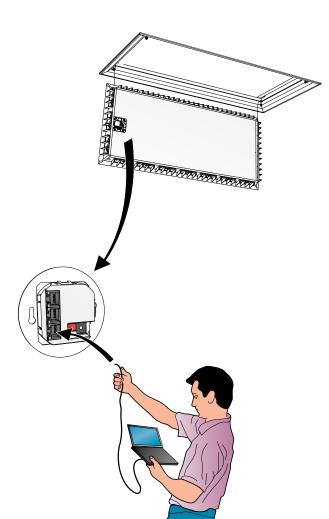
The CABLE CONVERTER USB-RJ12 (RS485) cable can be used for connecting a computer to the module for e.g. entering software settings.
